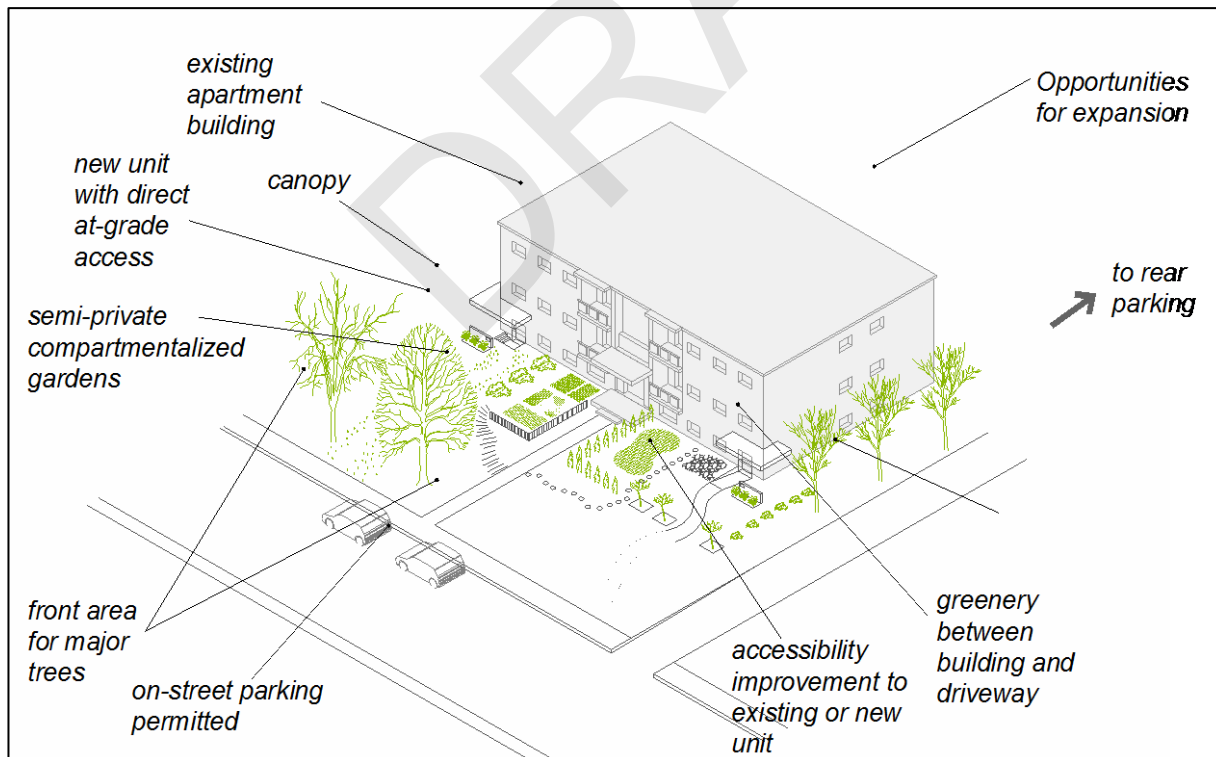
Demonstration Plan for possible renovation of low-rise apartment building (UDG Section 7, Figure 7.11).
